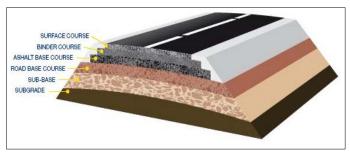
Typical pavement layers *Source: MDOT (2006)*.
